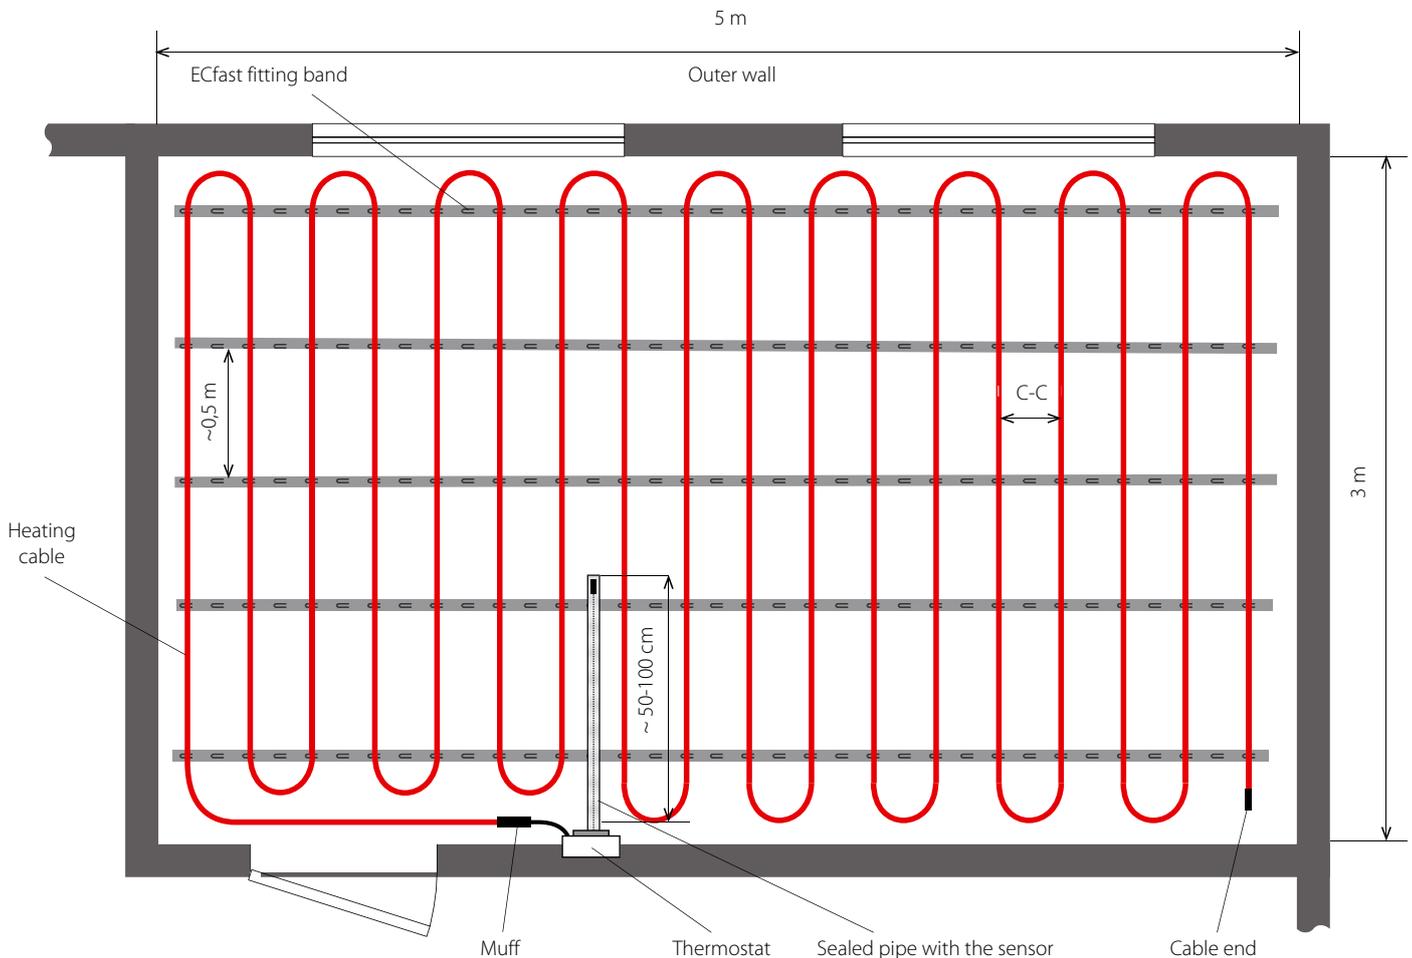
Example of heating cable installed in a room. Direct Floor Heating
